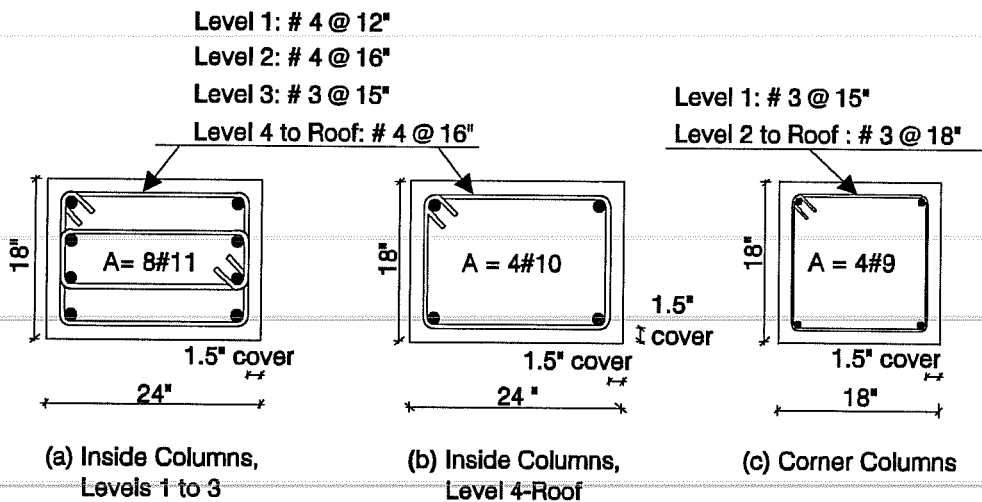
Reinforcement Details of the Columns of the Seven Story Building
